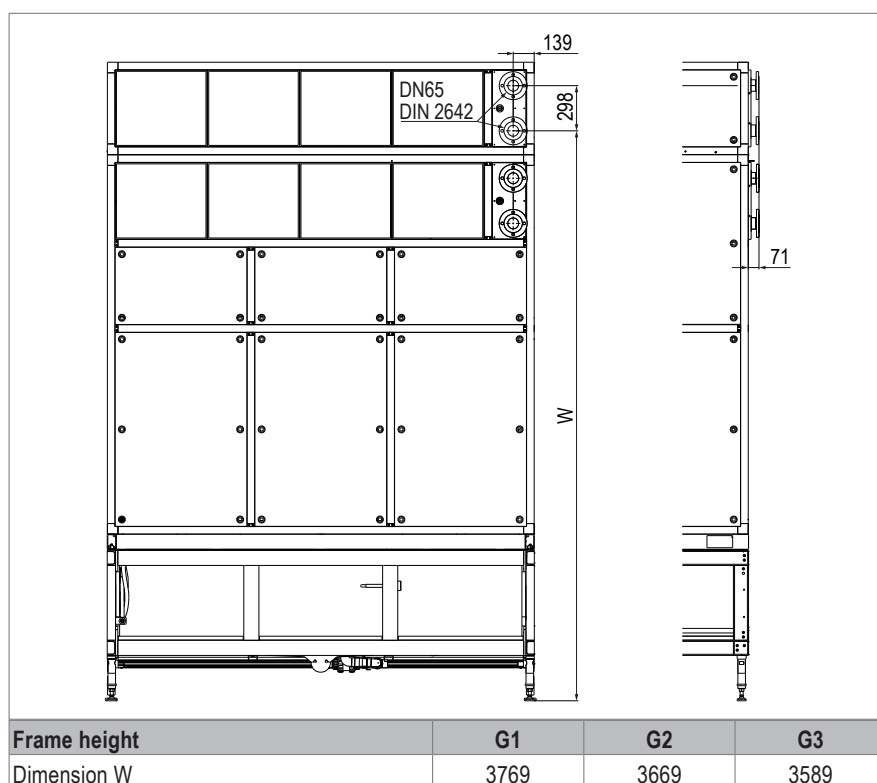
Connection dimensions water coil on extract air side (dimensions in mm)
